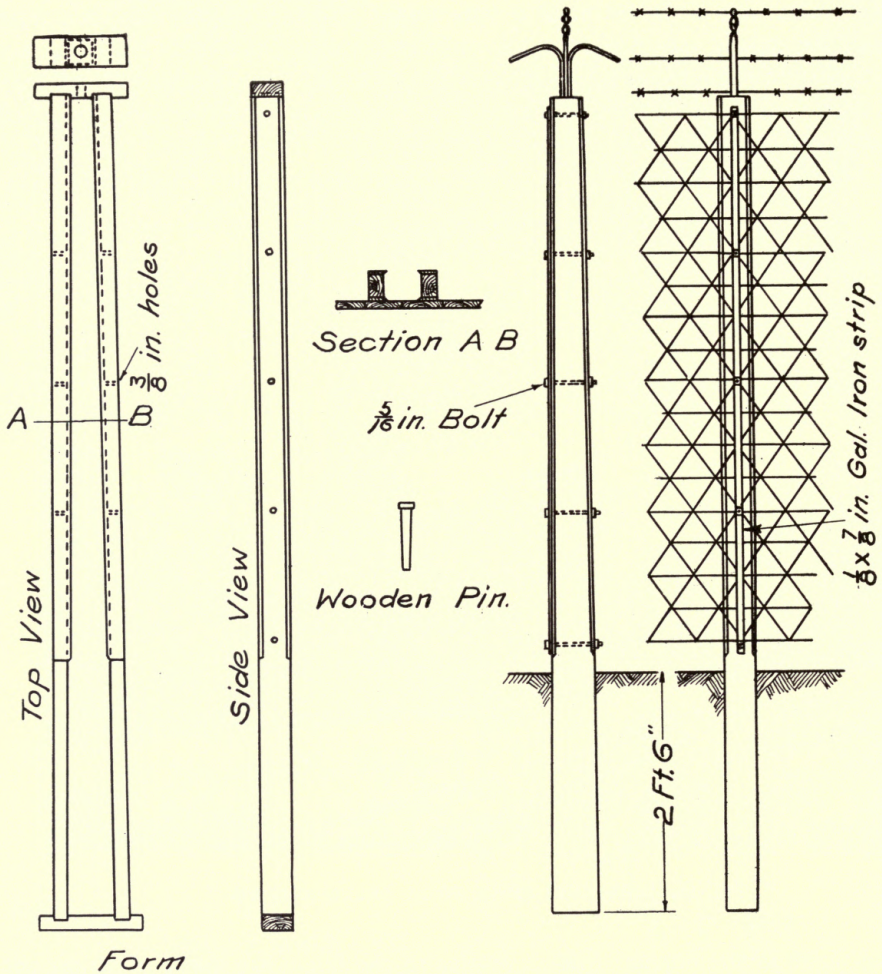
DETAILS OF CONSTRUCTION, DELLWOOD PARK FENCE POSTS.
